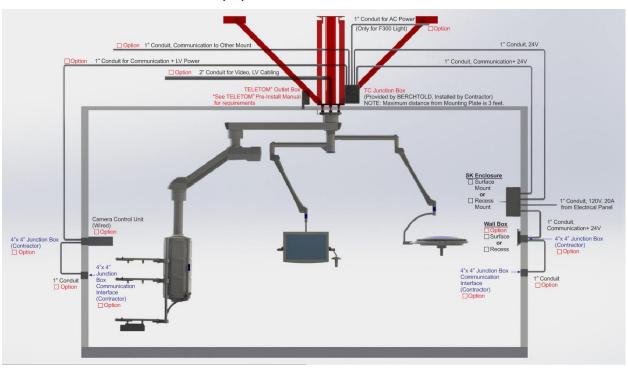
TELETOM® with CHROMOPHARE® (TC) Conduit Plan, Elevation View
